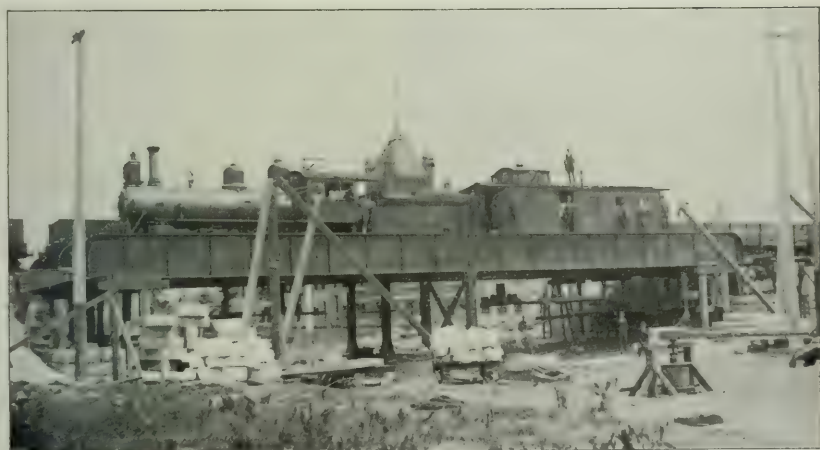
IRVING PARK BOULEVARD 100 FT. CLEAR SPAN WITH CENTER POSTS. Shows also the building of stone abutments in progress.
